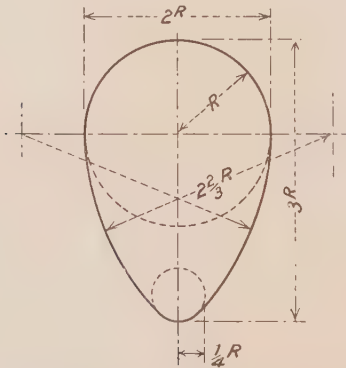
New Type of Section for Brick Sewers suited for both Small and Large Flows.
